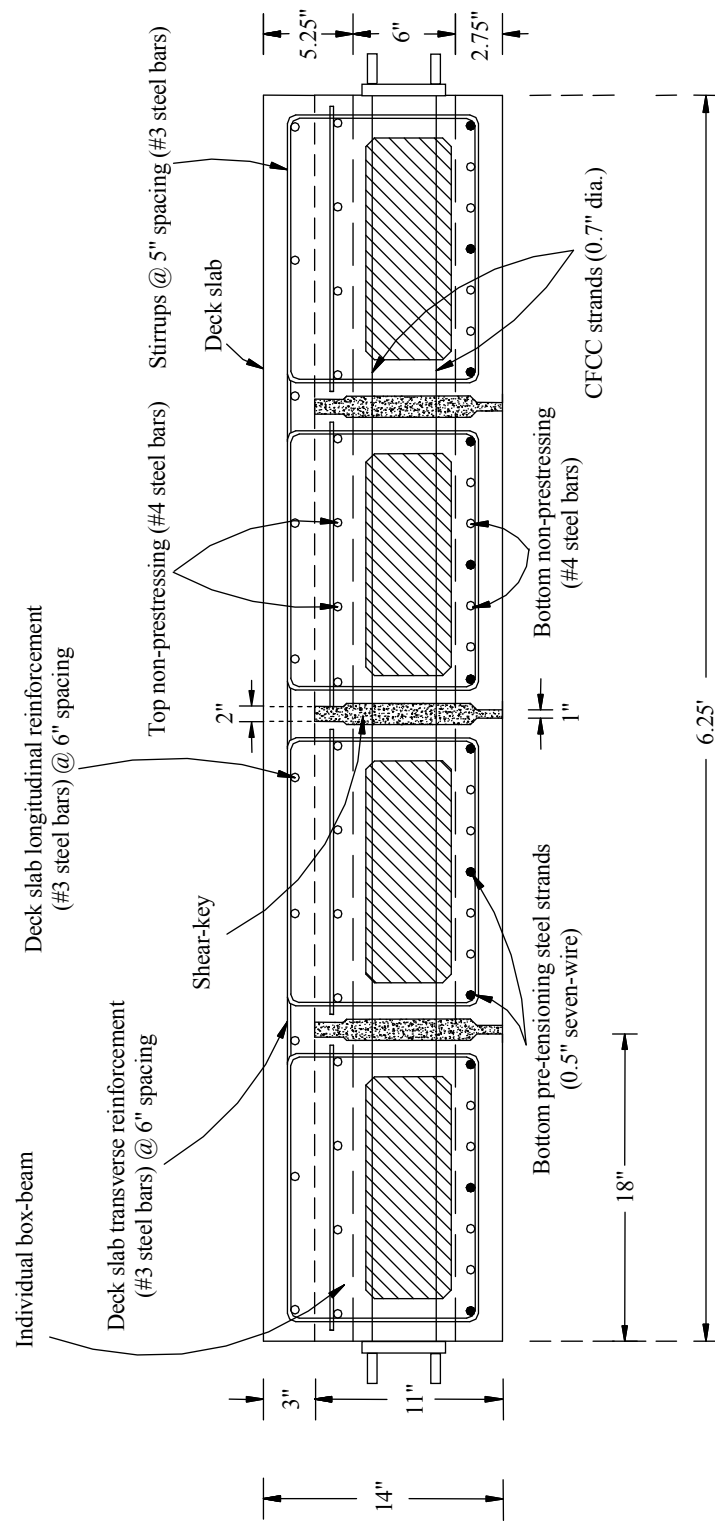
Cross-section of the completed box-beam bridge model.
